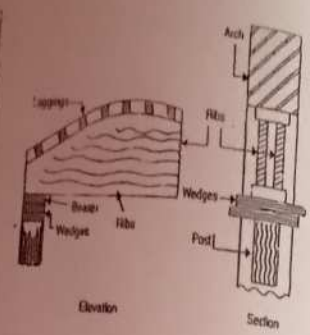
TIMBER CENTERING FOR WIDER SOFFITS
